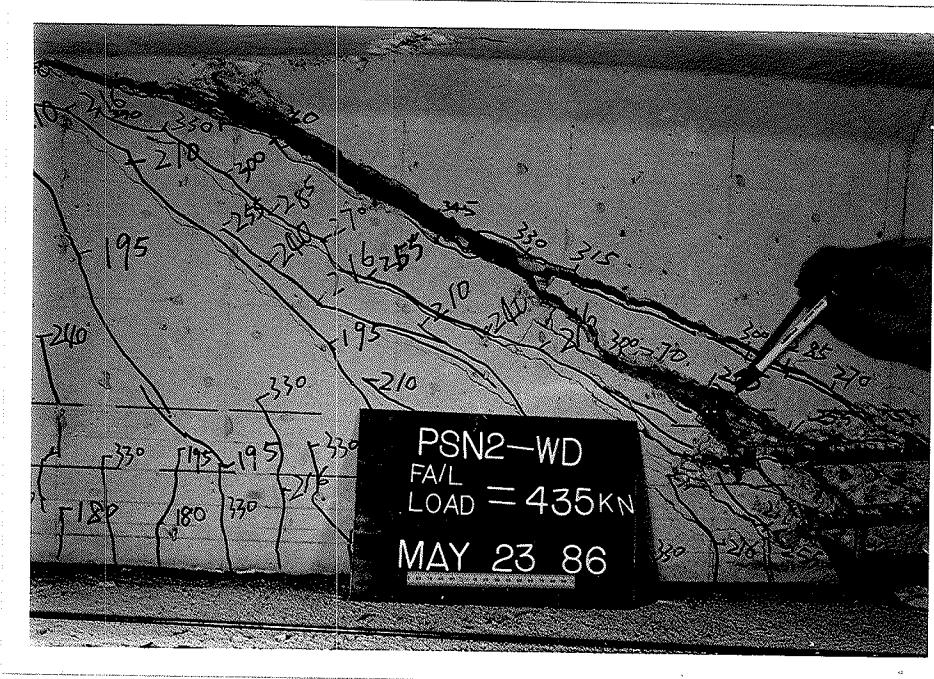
PSN2 Failure Crack of Beam PSN2-WD
